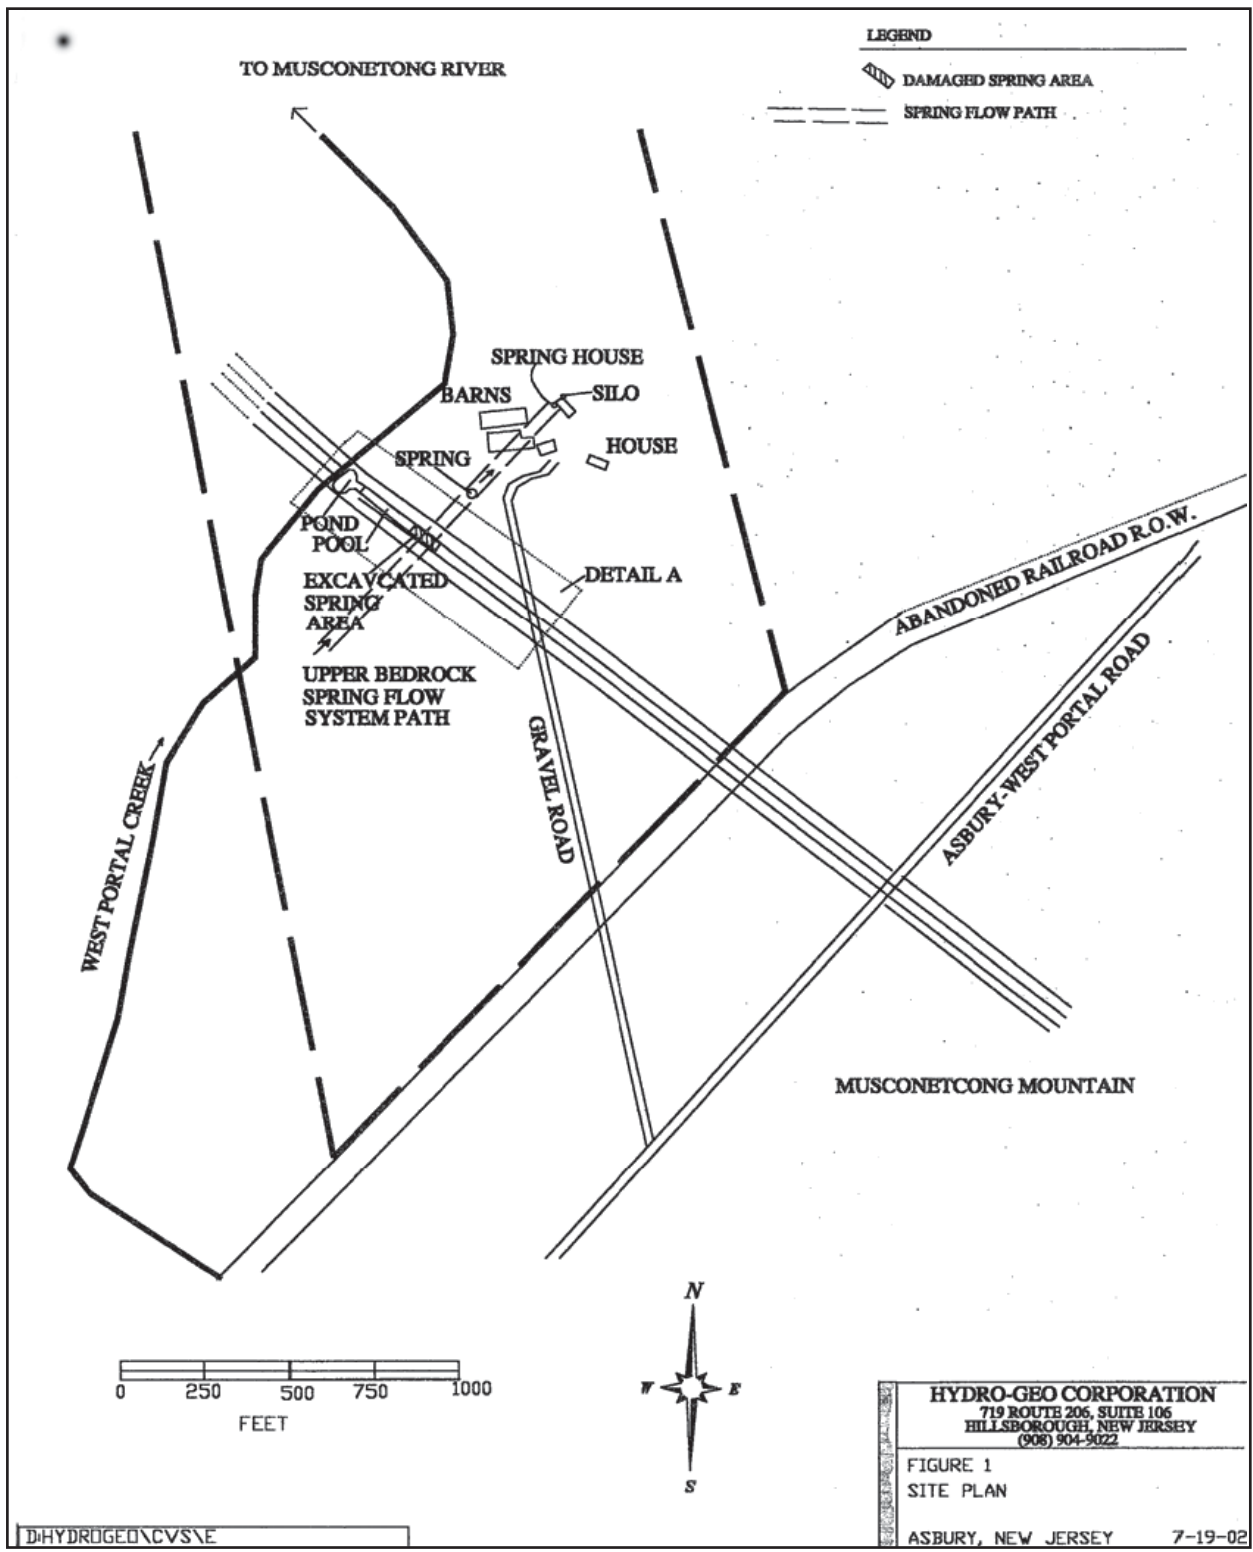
Site Plan. Shows major site features including the Spring House, barns, excavated spring area and location of Detail A shown on Figure 2.
